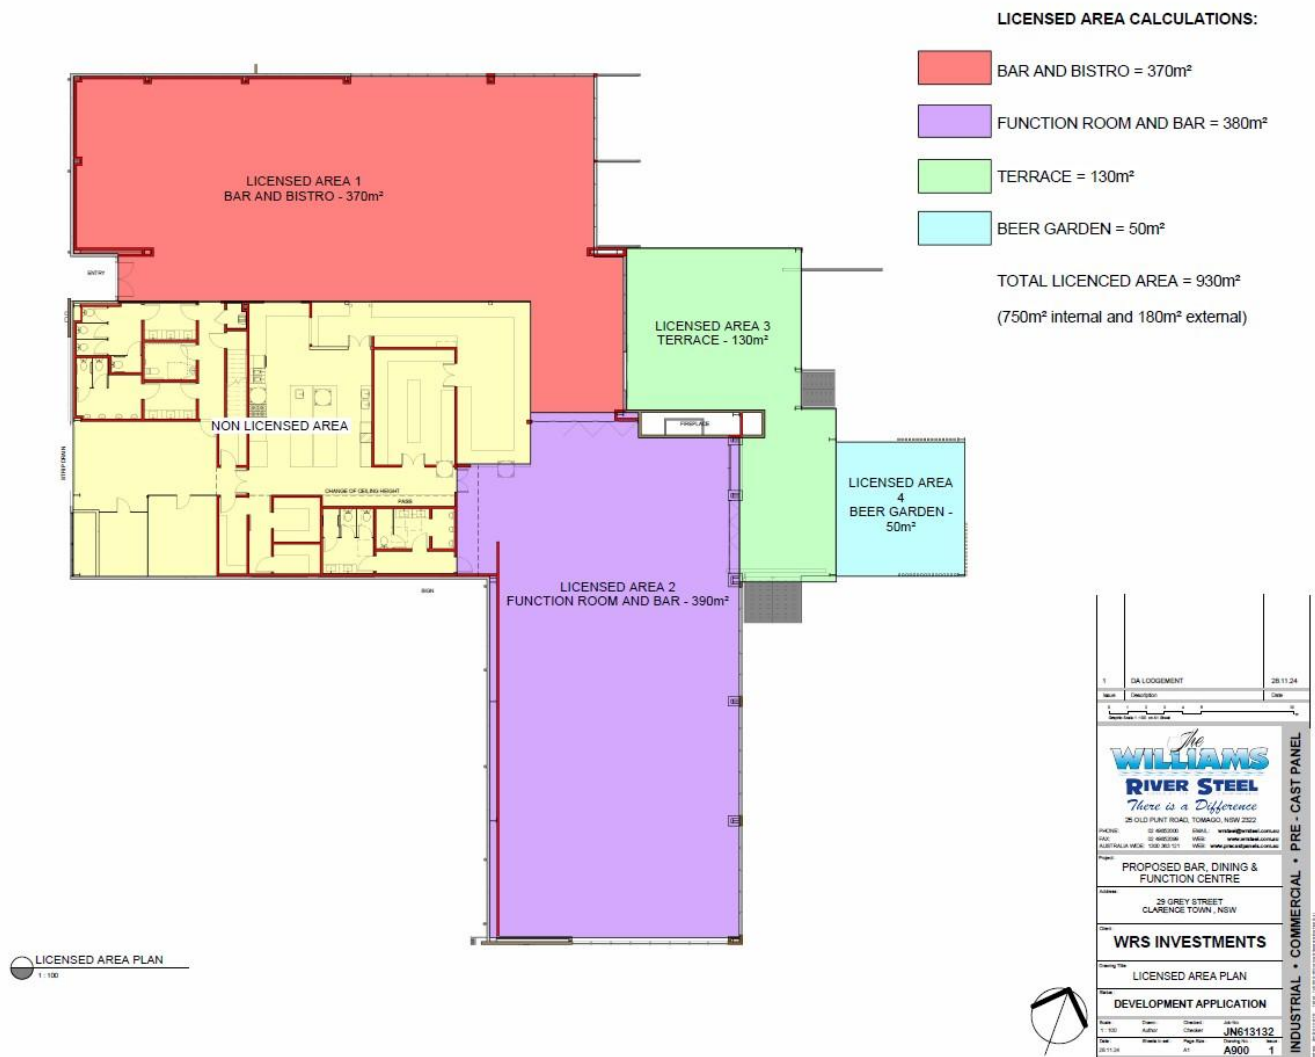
ground floor plan (Williams River Steel - Architectural plans)
